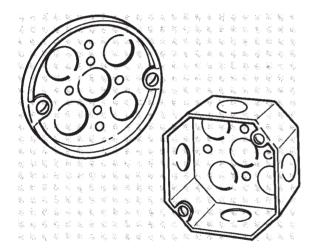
Boxes for armored cable and nonmetallic-sheathed cable.
